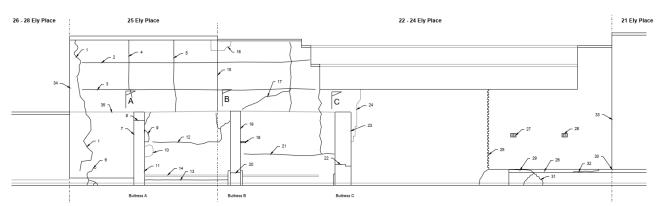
, Boundary Wall, East Facing : Several Cracks are evident and the existing primary features need to be stabilised.
